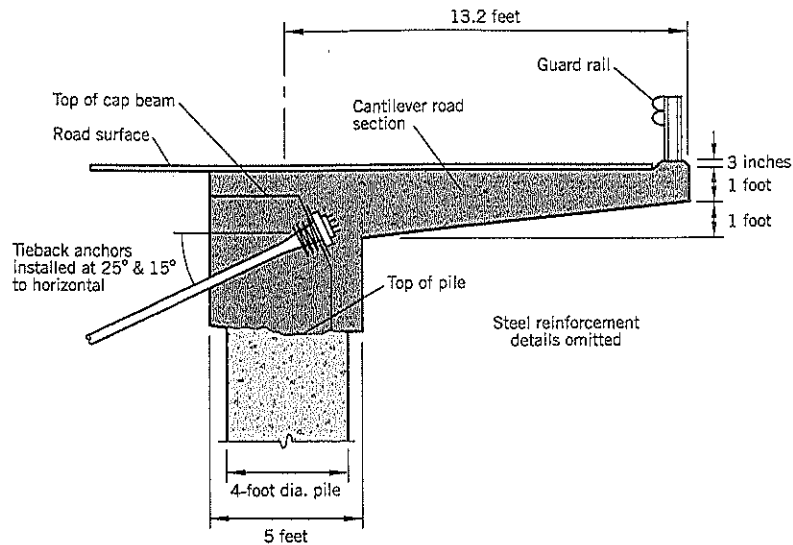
Goat Lick Slide. Section showing details of the pile top, cap beam, tieback anchor, and cantilever road section.
